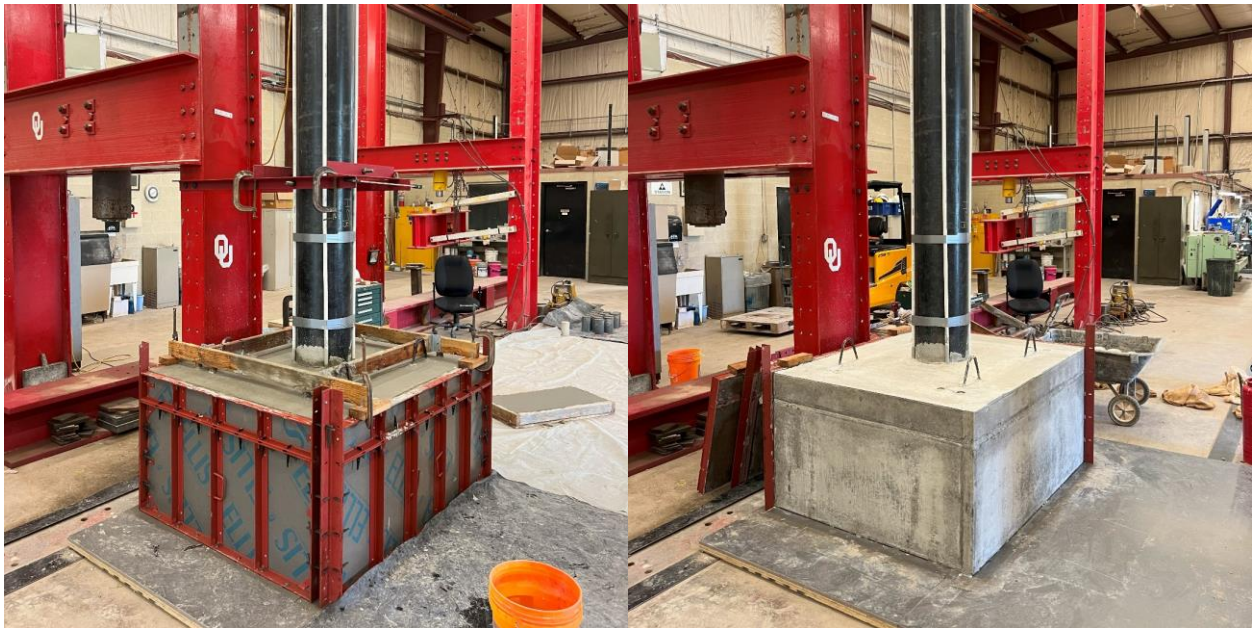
HC-FCS Column Base Construction, Immediately After Casting and Finishing (l) and After Stripping the Formwork (r)
